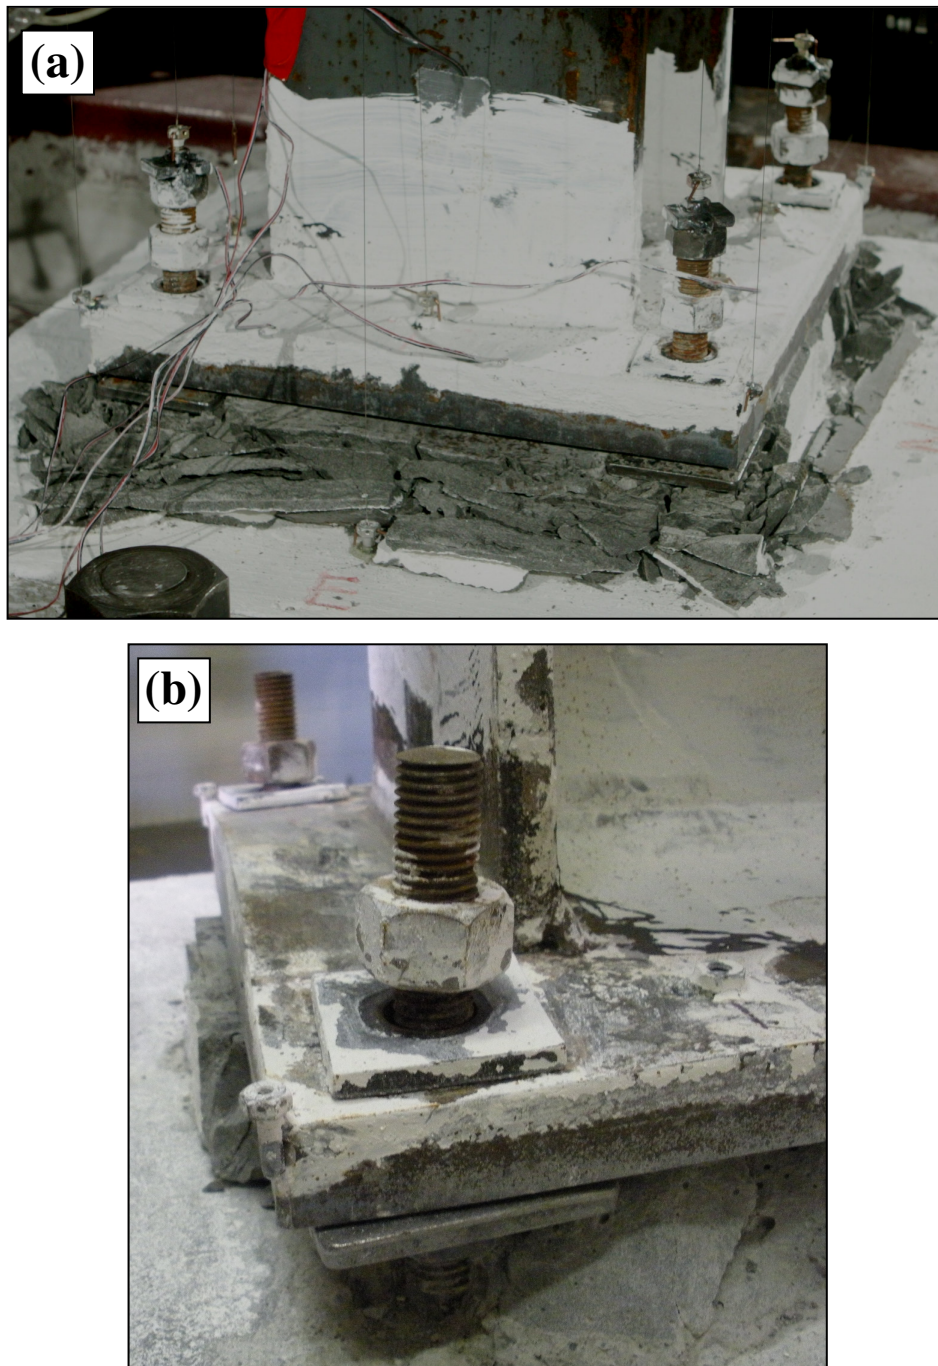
(a) Photograph illustrating anchor rod yielding (shown here for Test #4) and (b) representative close-up of anchor rod yielding
